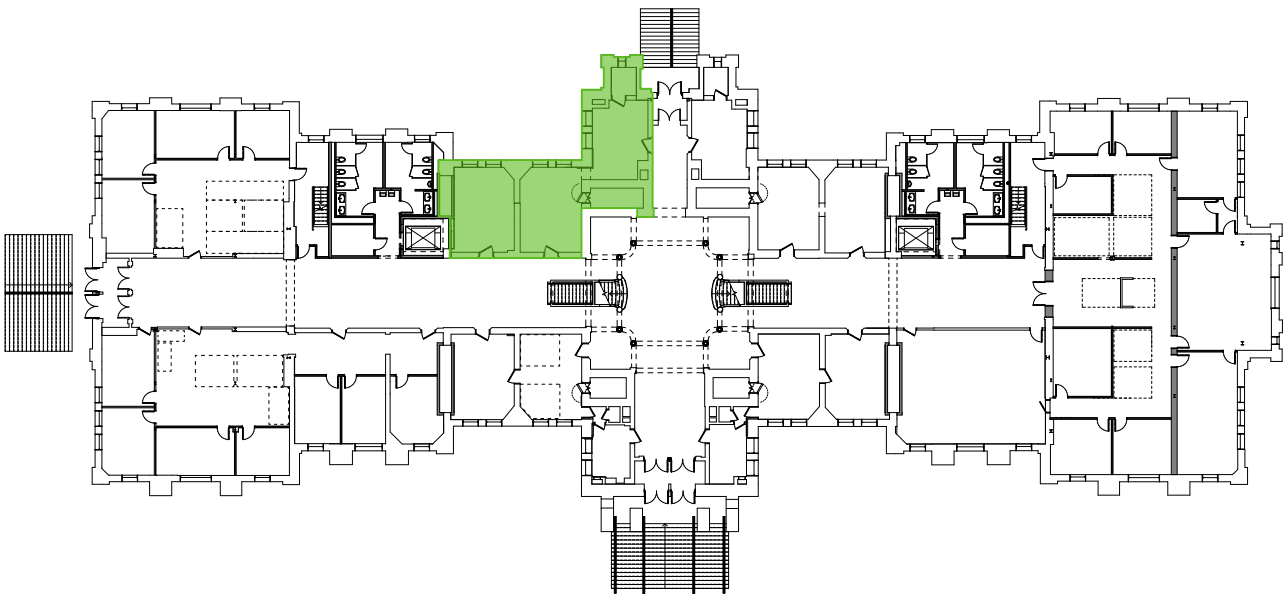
Proposed Space Allocation: Elected Rooms - First Floor [Capitol]
